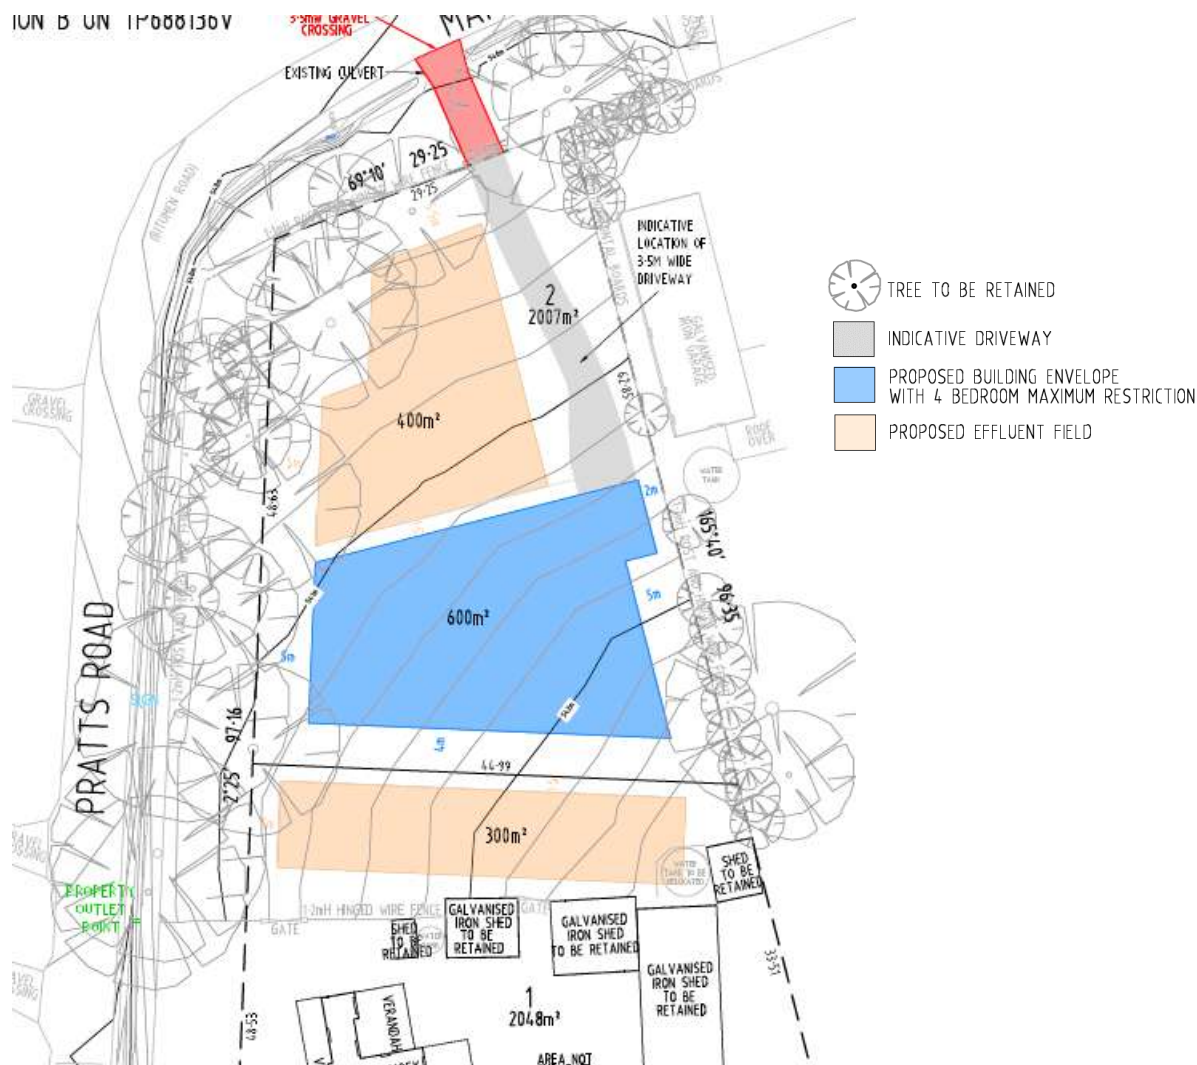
Proposed plan of subdivision shows building envelope on Lot 2 and effluent fields on both lots.
